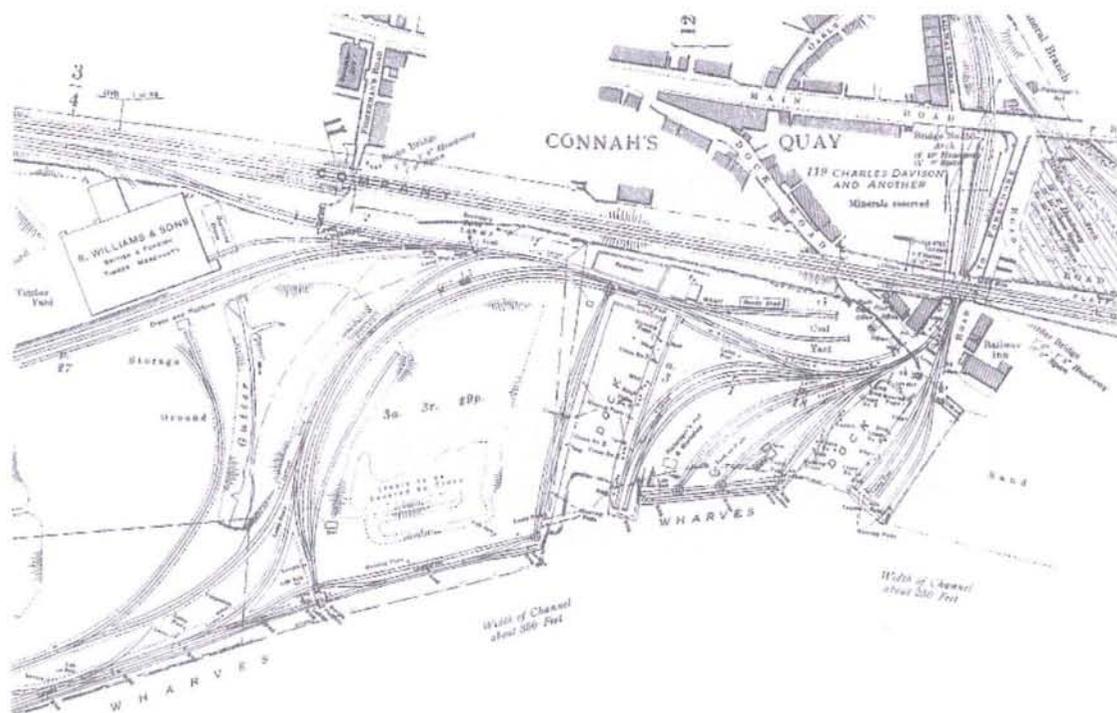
Plan of Connah's Quay docks by Great Central Railways c. 1900
